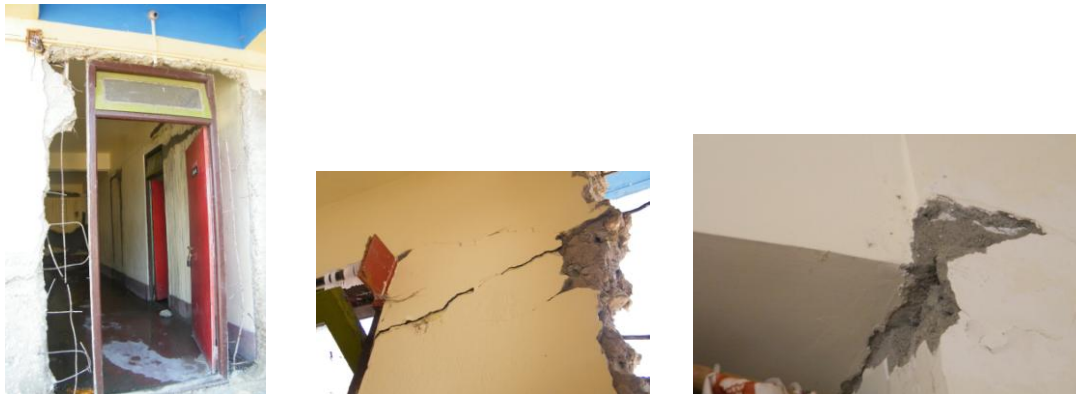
Detachment of door frame (left), Crack on pier masonry panels, (middle), Crack on spandrel masonry (right)
